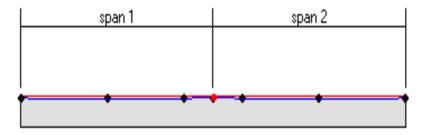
Shape of the Prestressed Tendons Added to the Bridge Section
